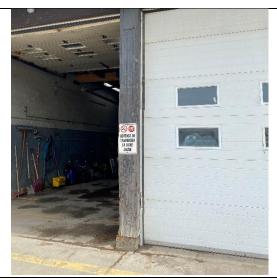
Typical arrangement of the roof over the garage with reinforcing grid.
